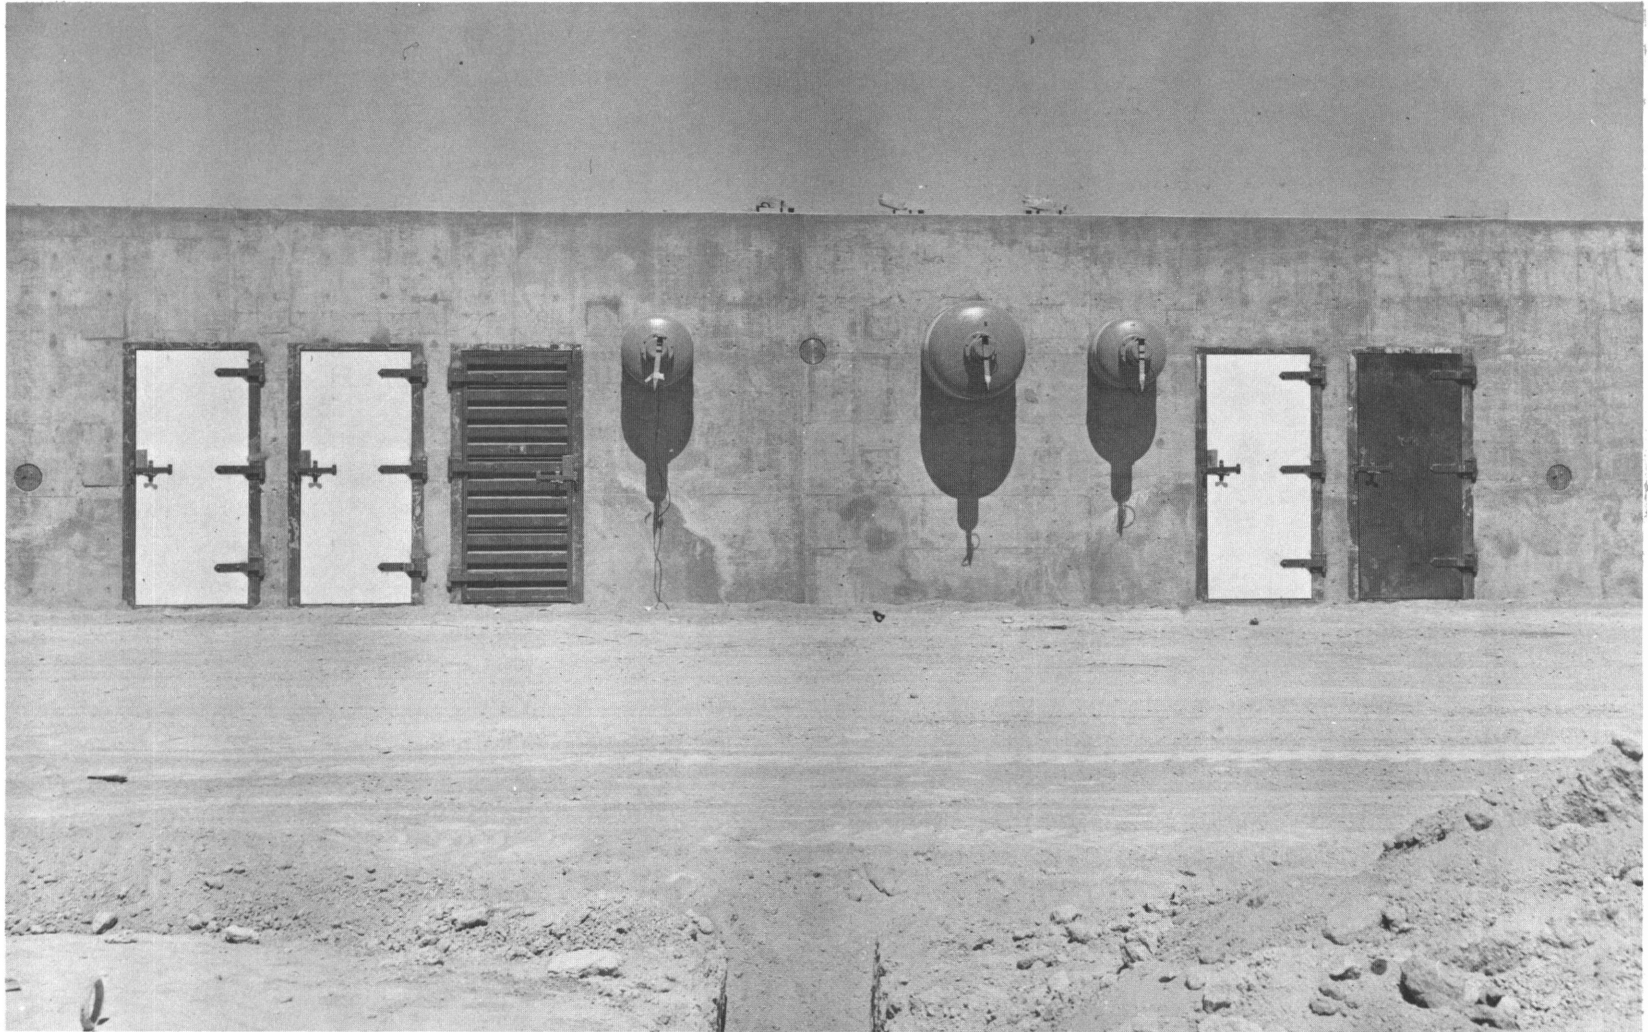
Typical cell closures. Doors, from left: solid plywood, wood plank, cellular steel, hollow plywood, and steel plate.
